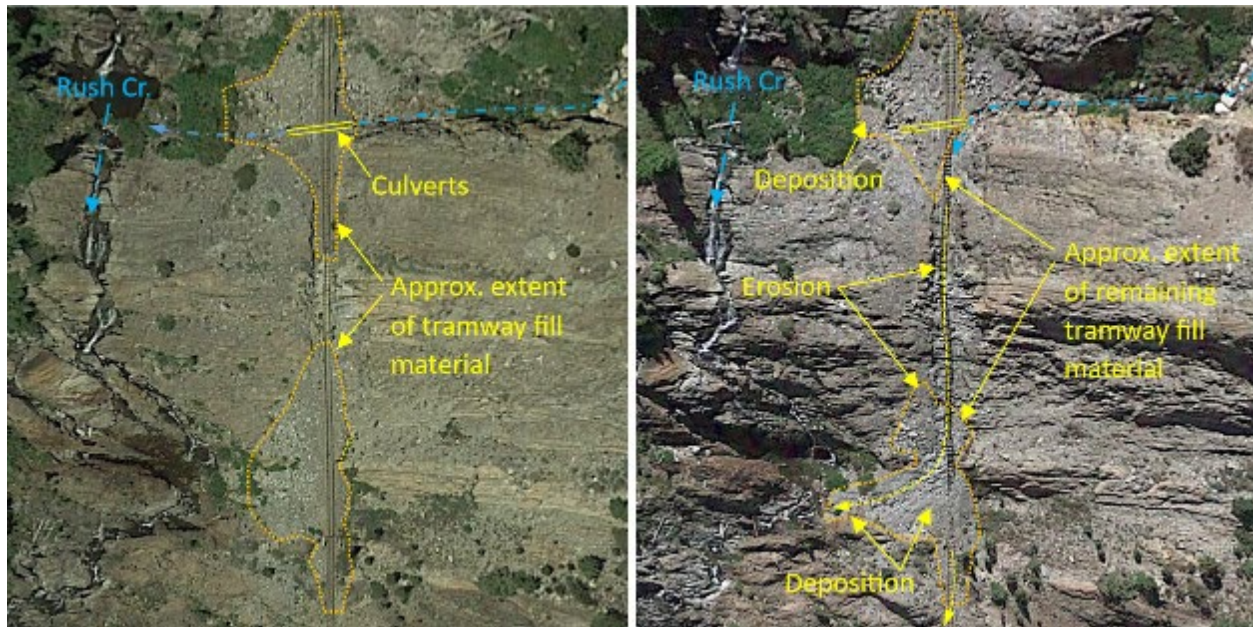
Before (2016) and after (2019) images showing the erosion and of the tramway fill slope after the culverts became plugged in the 2017 runoff season (location PE-6).
